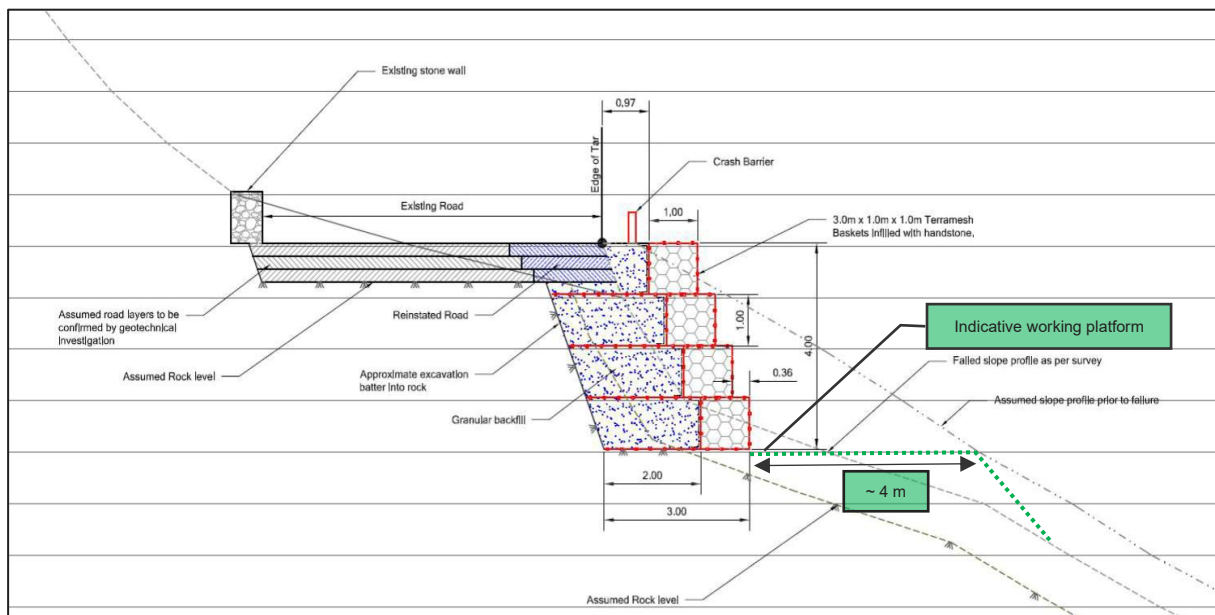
Terramesh retaining wall concept (Ingerop, 2024)
